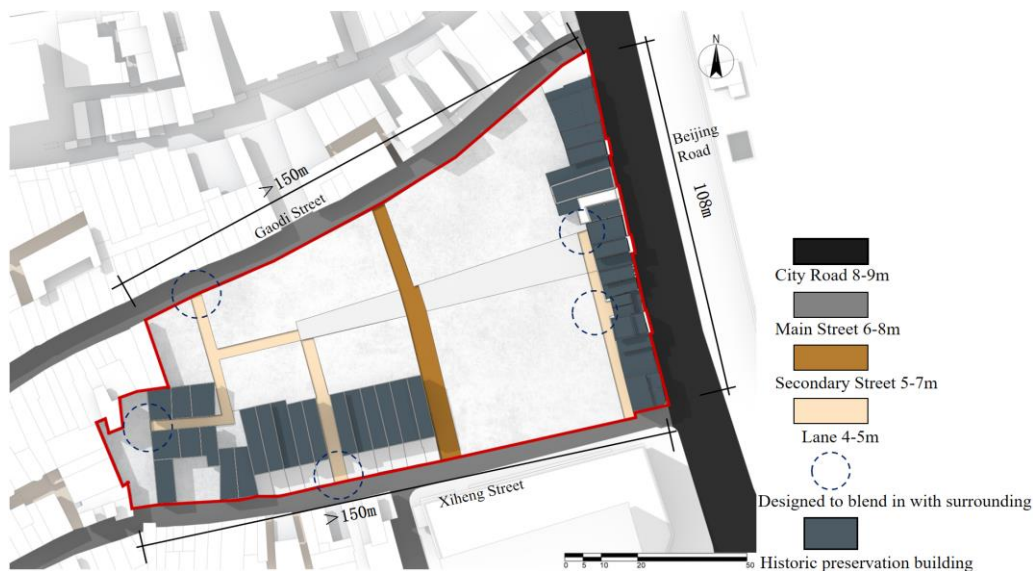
Illustration of street and lane system adjustments (Source: by the author)
